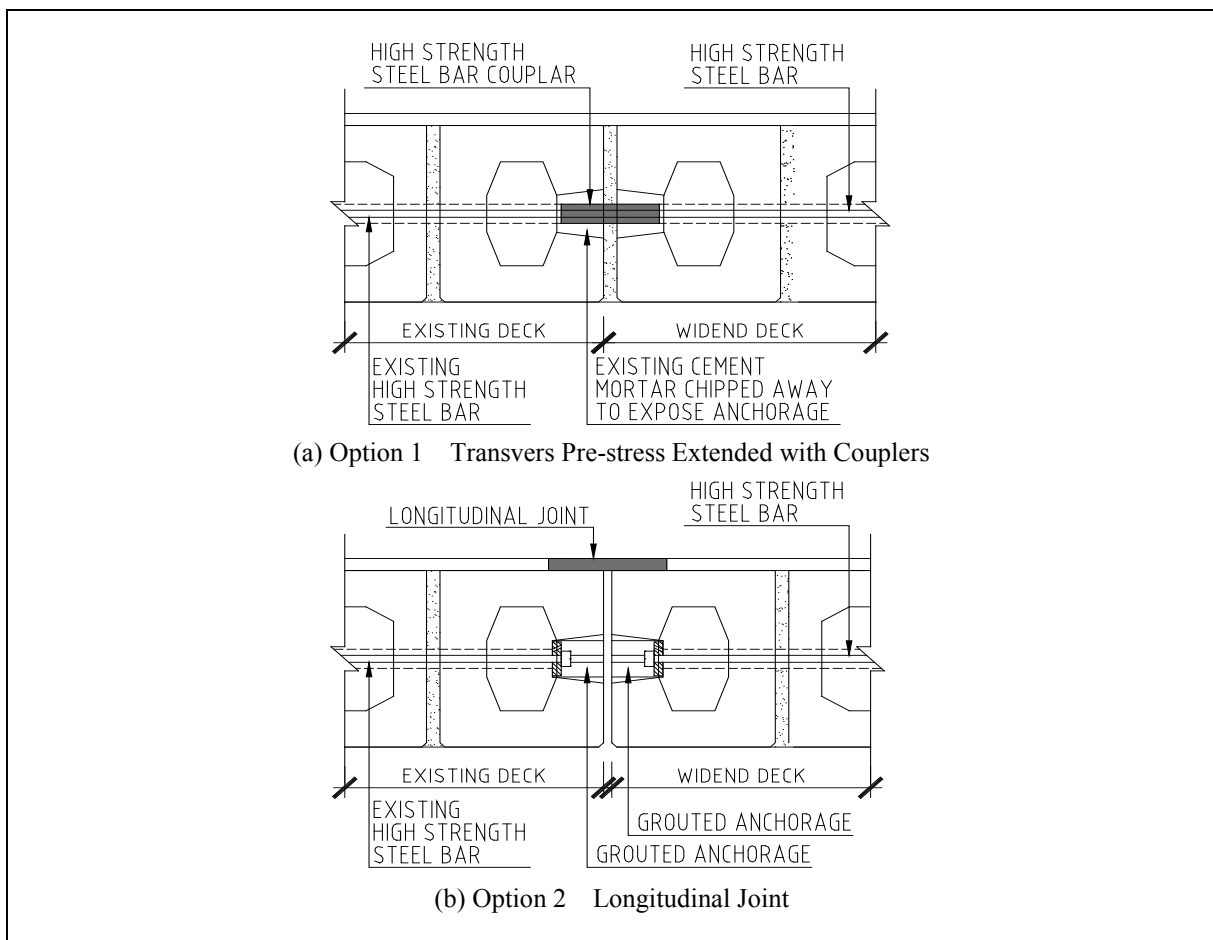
Deck Widening Connection Details for Full 4-Lane
